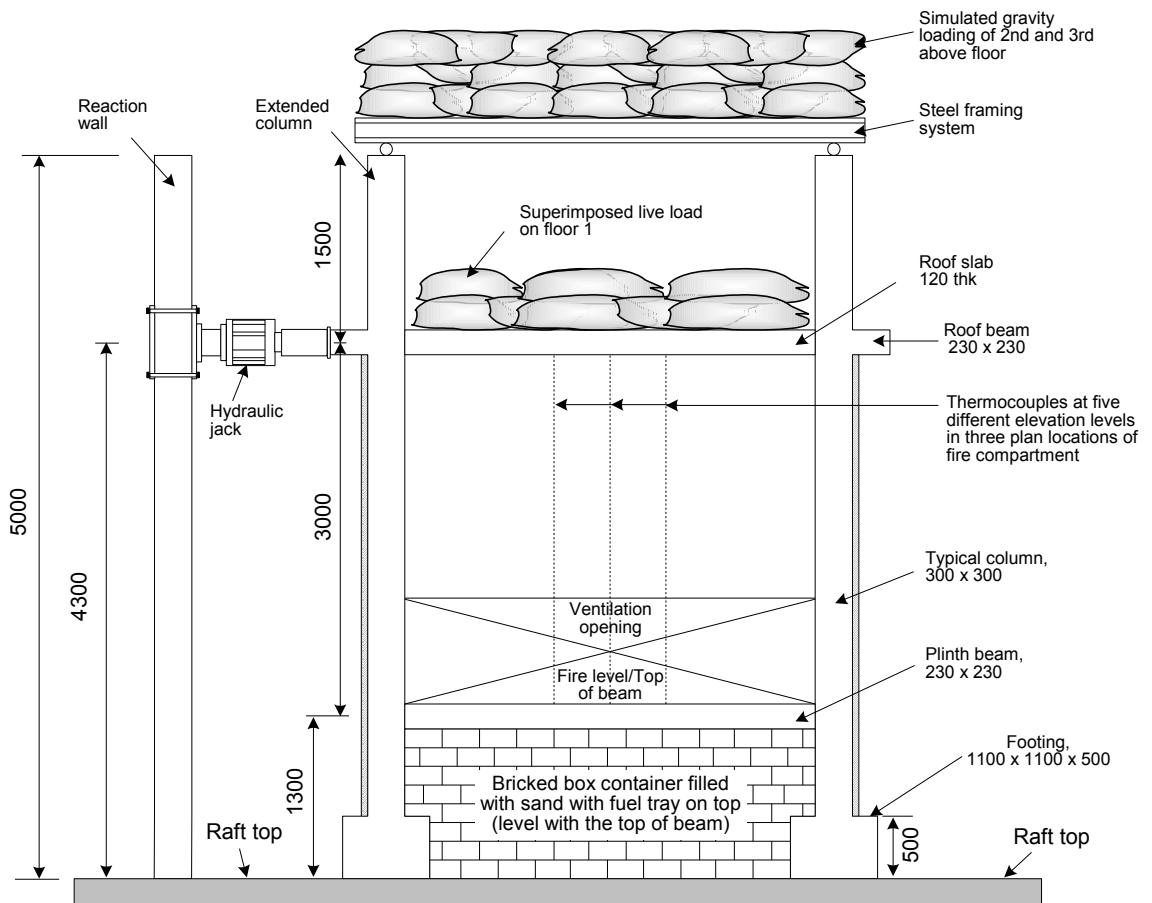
Schematic view of the test setup (all dimensions in mm) [206]
